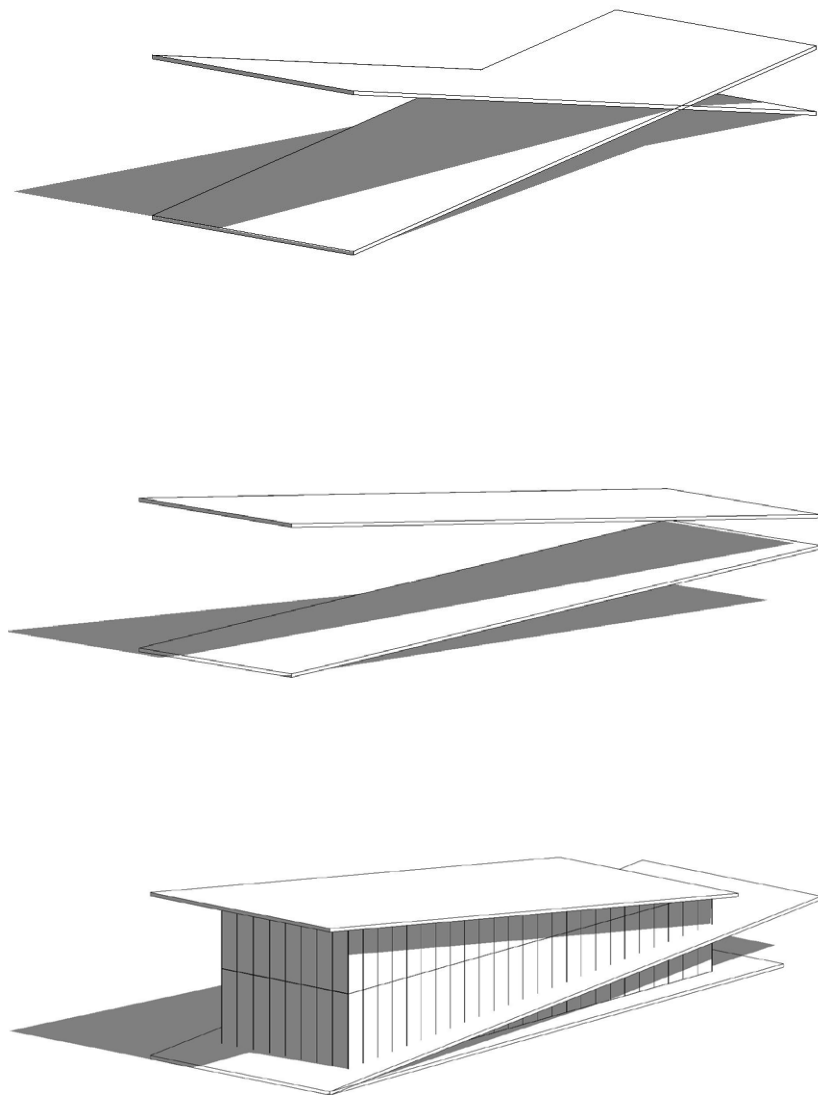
Iterations of inclined planes as roof, wall, roof, and circulation,
